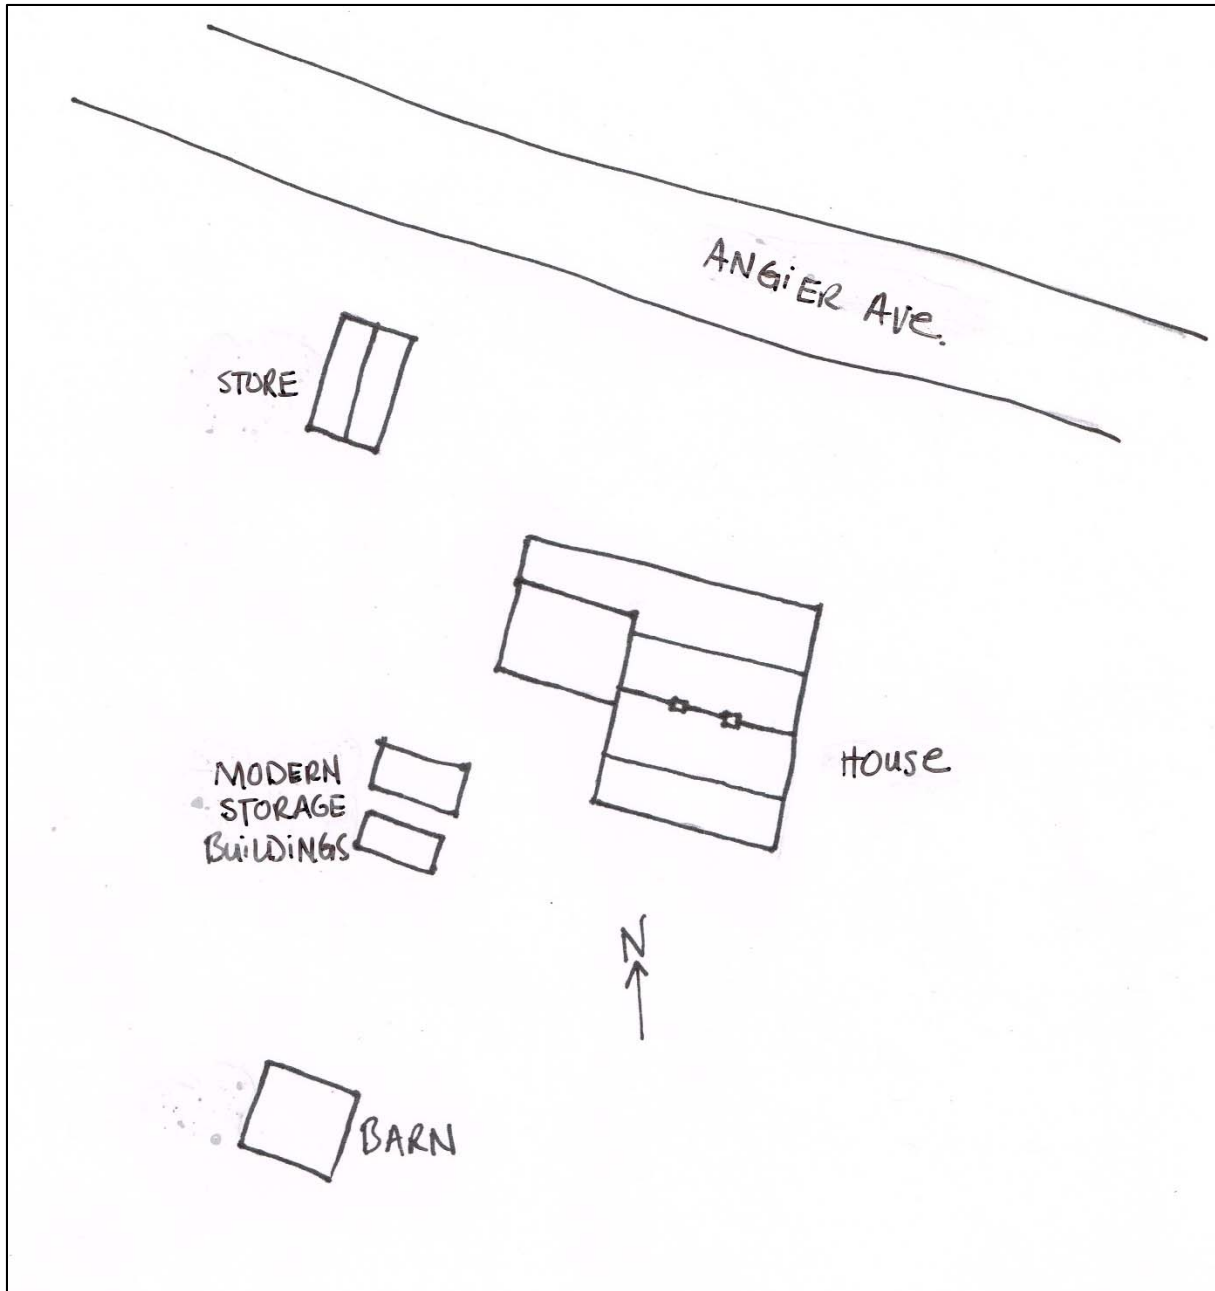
W. A. Beasley House and Store Site Plan, no scale
